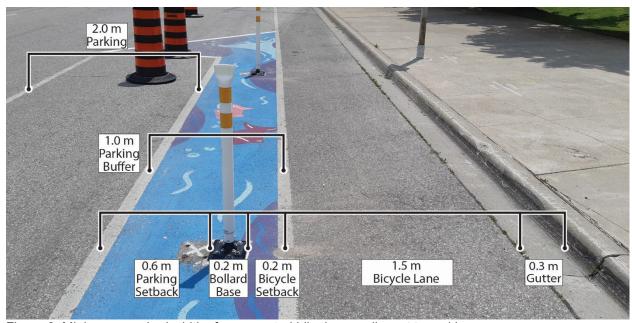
Minimum required widths for separated bike lanes adjacent to parking
